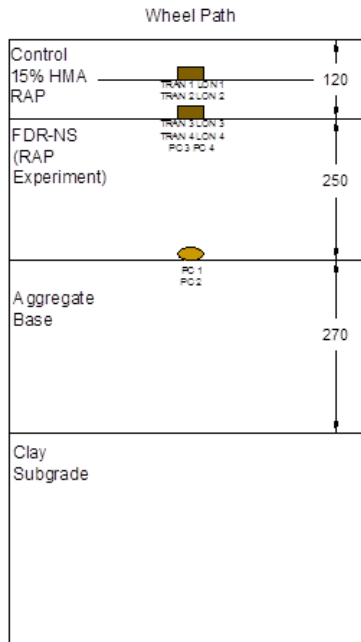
Illustration. Cross section of pavement structures and instrumentation for the 15%-RAP test section at UC-Davis (Multi-depth deflectometer not shown for clarity).
